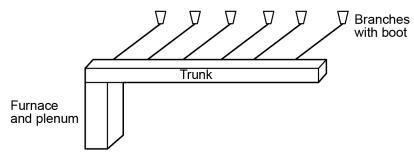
Trunk and branch (one-way system). (Skilled Trades BC, 2021) Used with permission.
